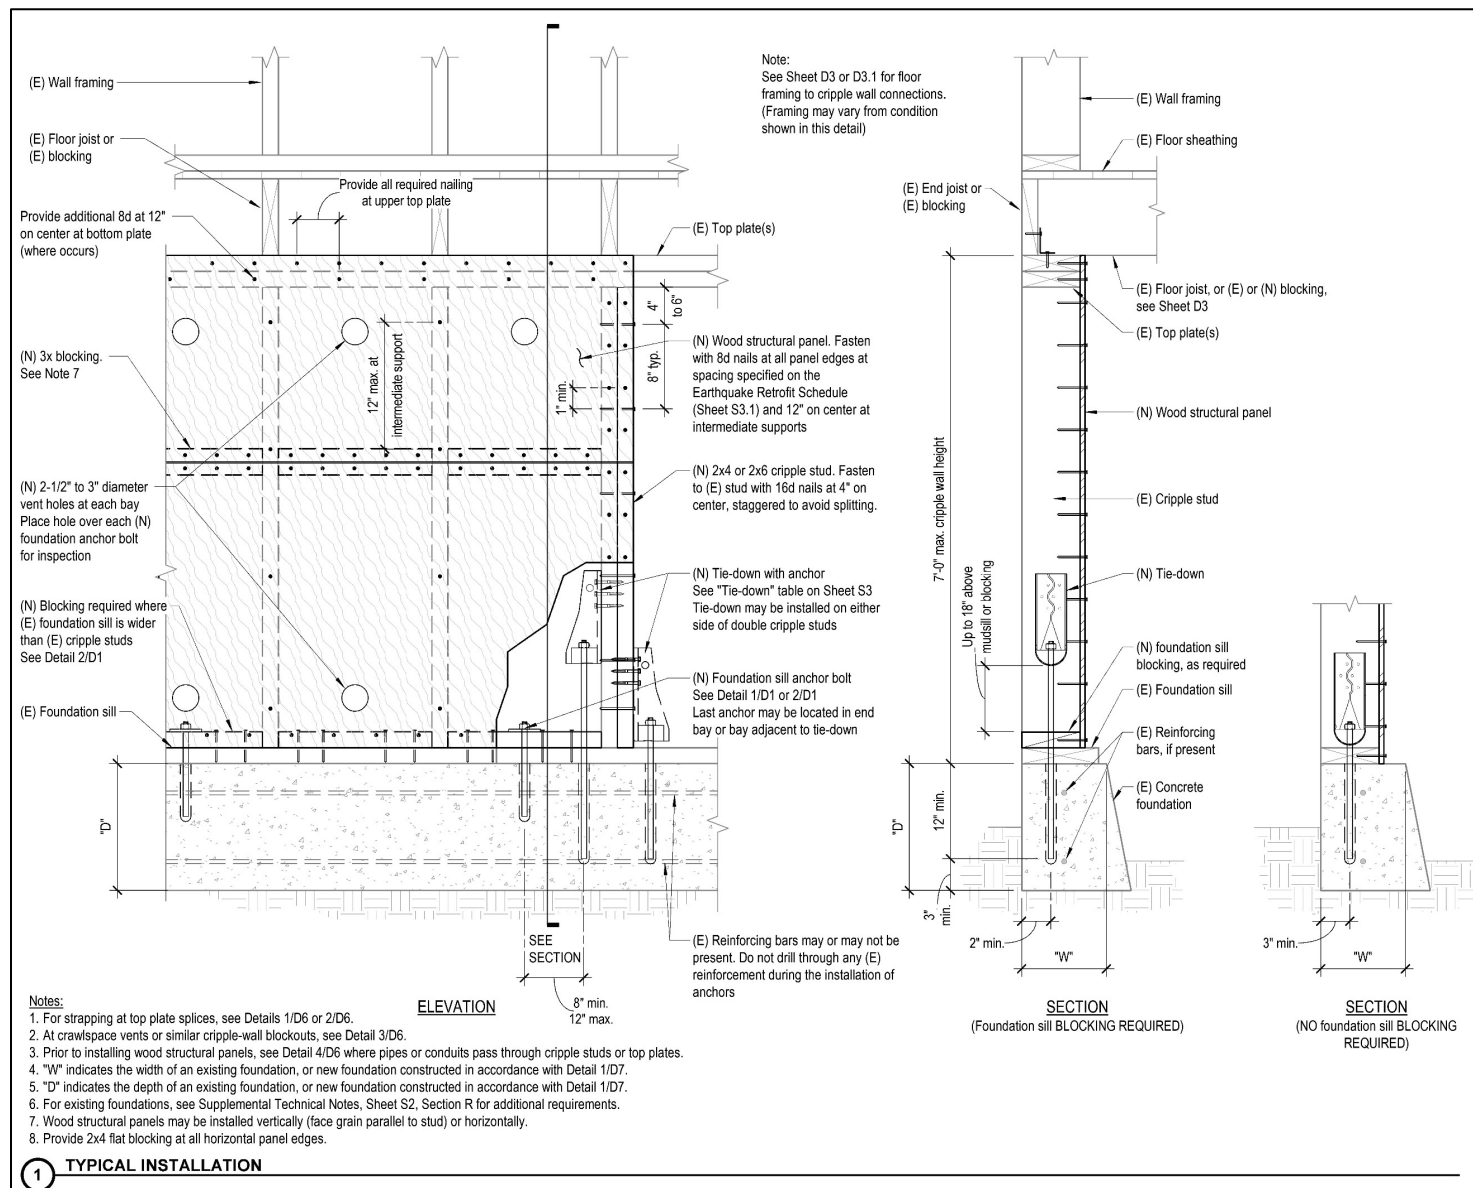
Wood structural panel installation with tie-downs. Sheet D5.
